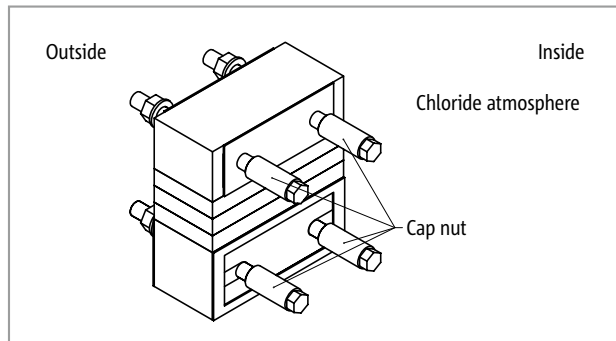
Schöck Isokorb® T type S with cap nuts: Isometric; internal atmosphere containing chloride
